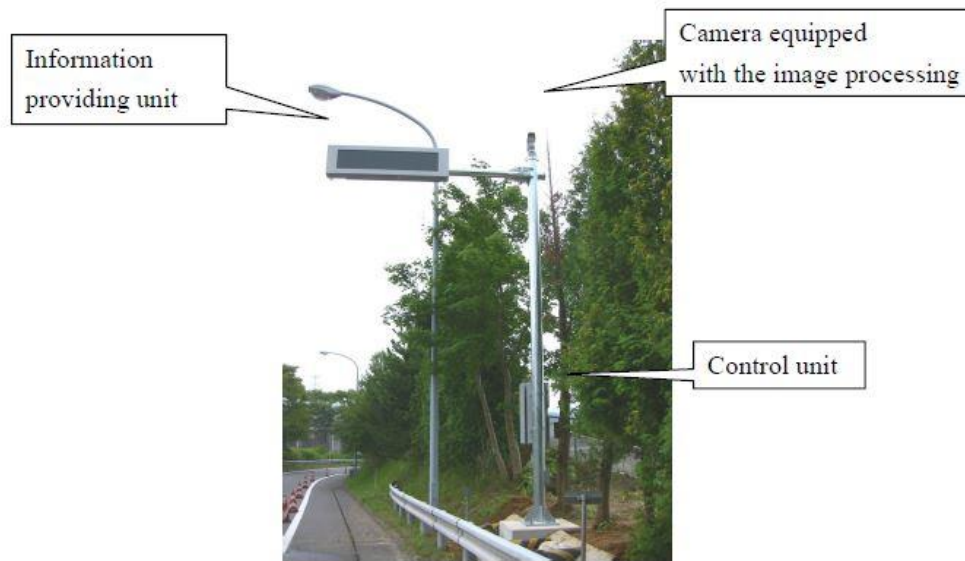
Information Providing Unit and Its Installation Arrangement (14).
